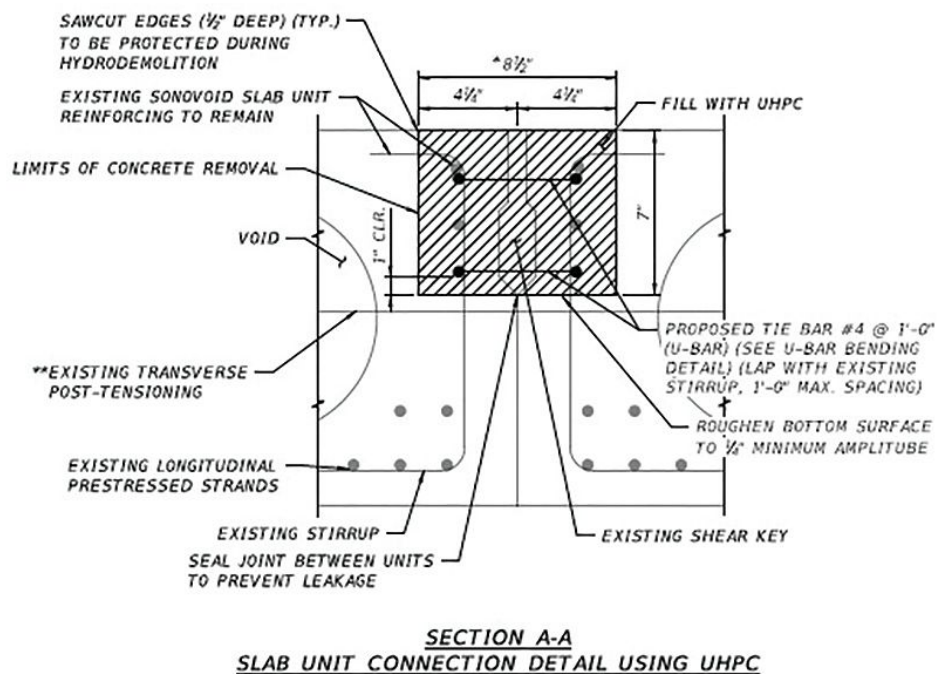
Detail for ultra-high-performance concrete in a reinforced joint between beams. Figure: Florida Department of Transportation.
